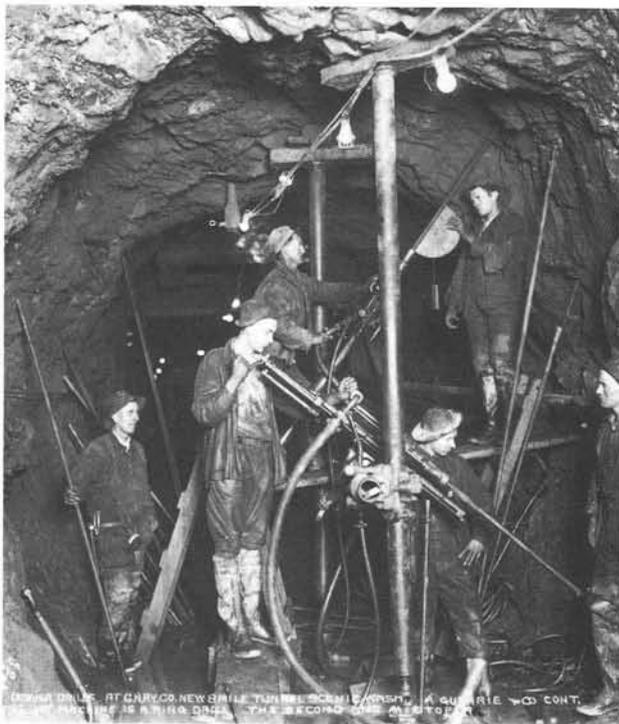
Ring drilling in center heading for enlargement to full tunnel. Courtesy of Special Collections Division, University of Washington Libraries. Photo by L. Pickett, negative 3534
